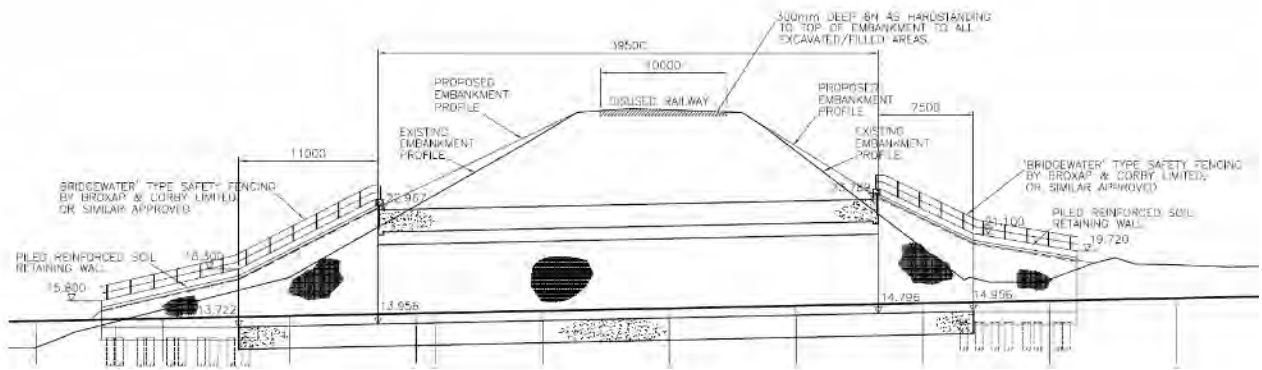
Bridge longitudinal section (extracted from drawing SD 5044/1)
